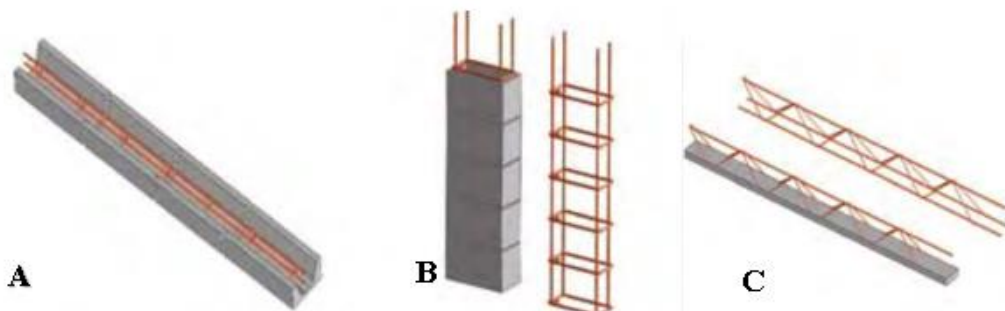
A) Precast lintel using U-shape HCB connecting with reinforcement B) precast HCB column and reinforcement C) precast beam using HCB and reinforcement
